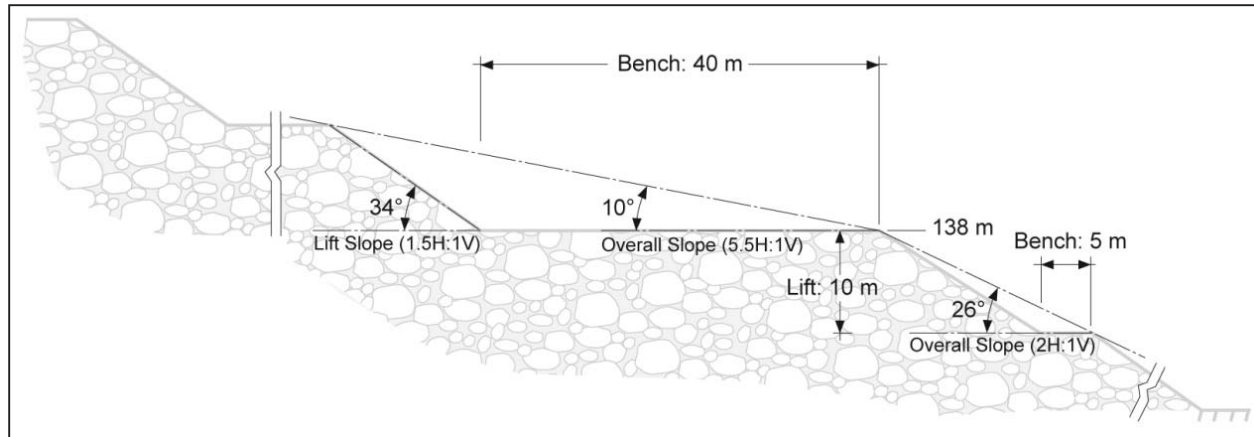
Typical Cross-Section - Waste Rock Dump (by WSP)
